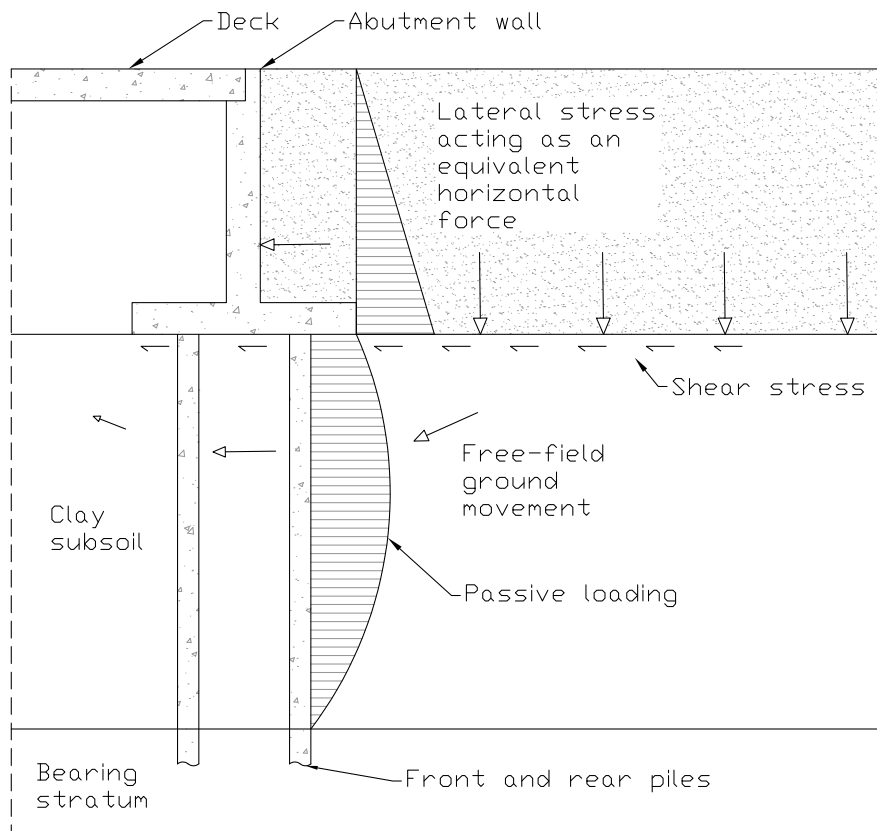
Loads on piled bridge abutment originating from approach embankment (adapted from Kelesoglu & Springman, 2011)
